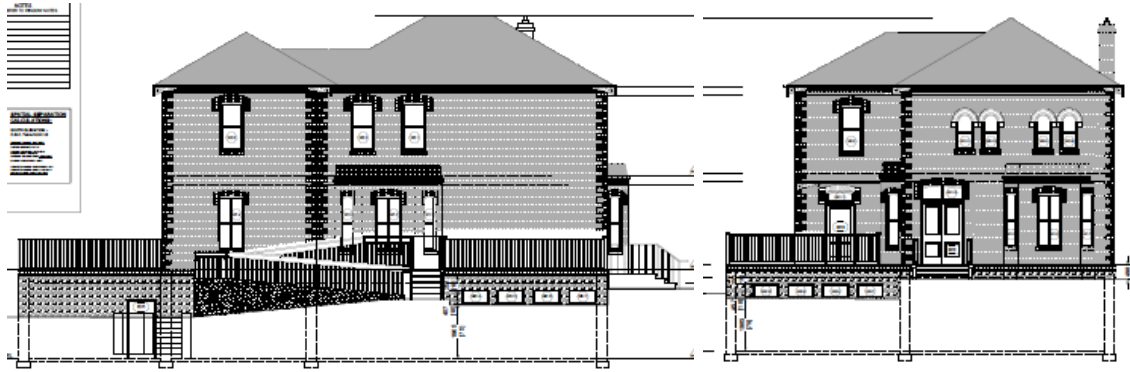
South & East Elevations, Phase 1 Armstrong House Daycare (AREA, May 1, 2024)
